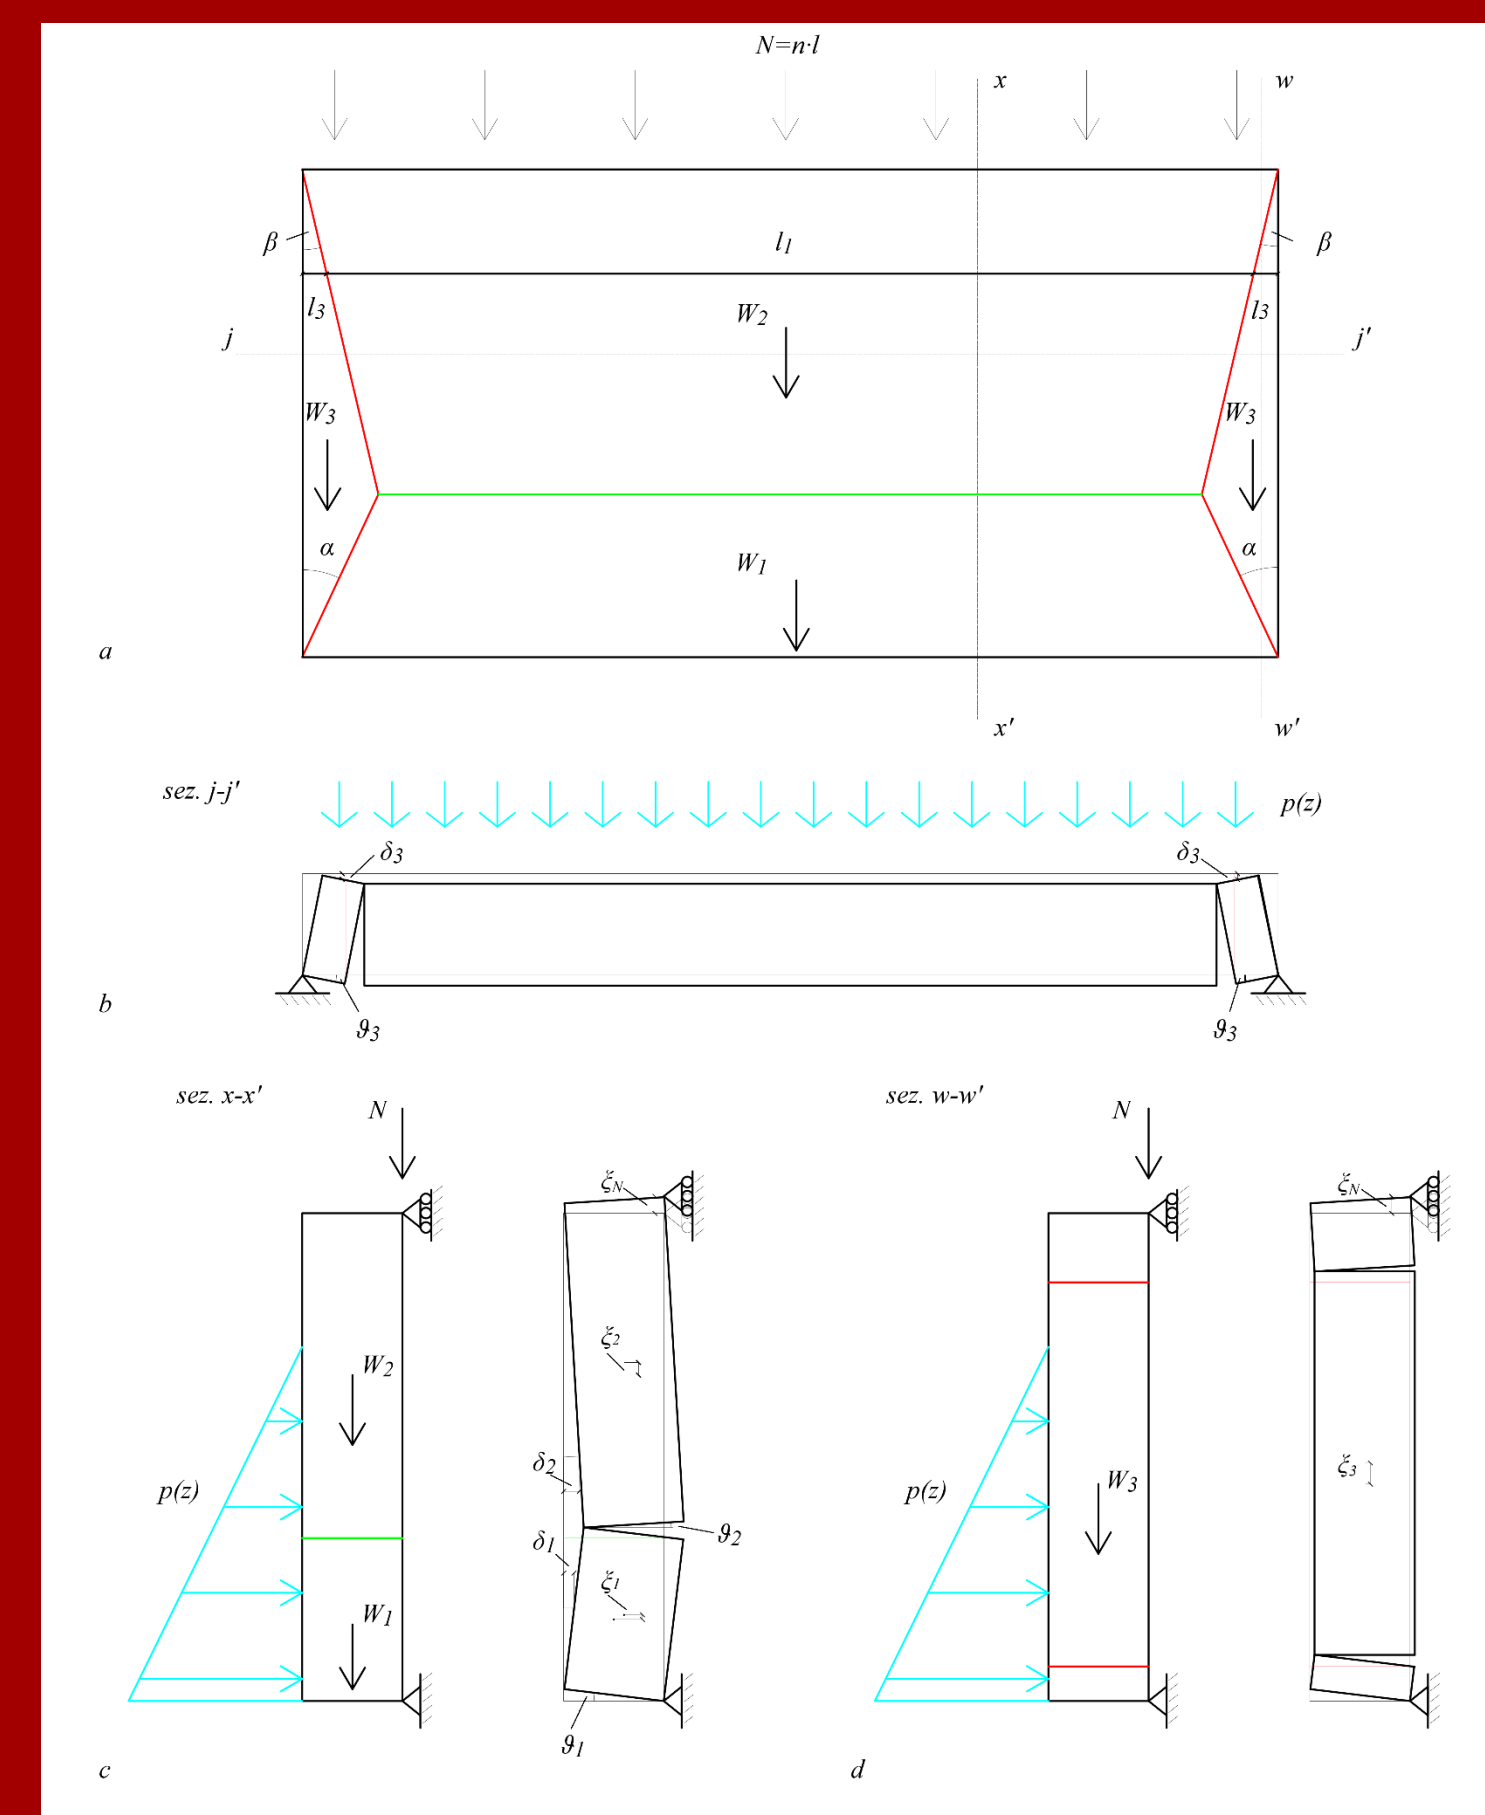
4-edges support: wall simply supported on the cross-walls, at the top, and foundation levels. Front view (a), plan cross section (b) and vertical cross sections (c, d).
